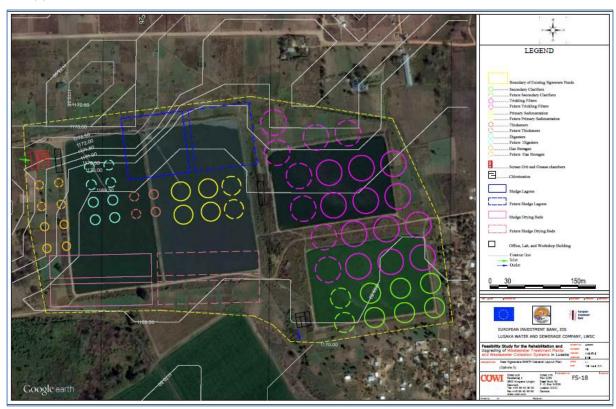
Ngwerere site: sewage ponds, new WWTP layout and surrounding land use
